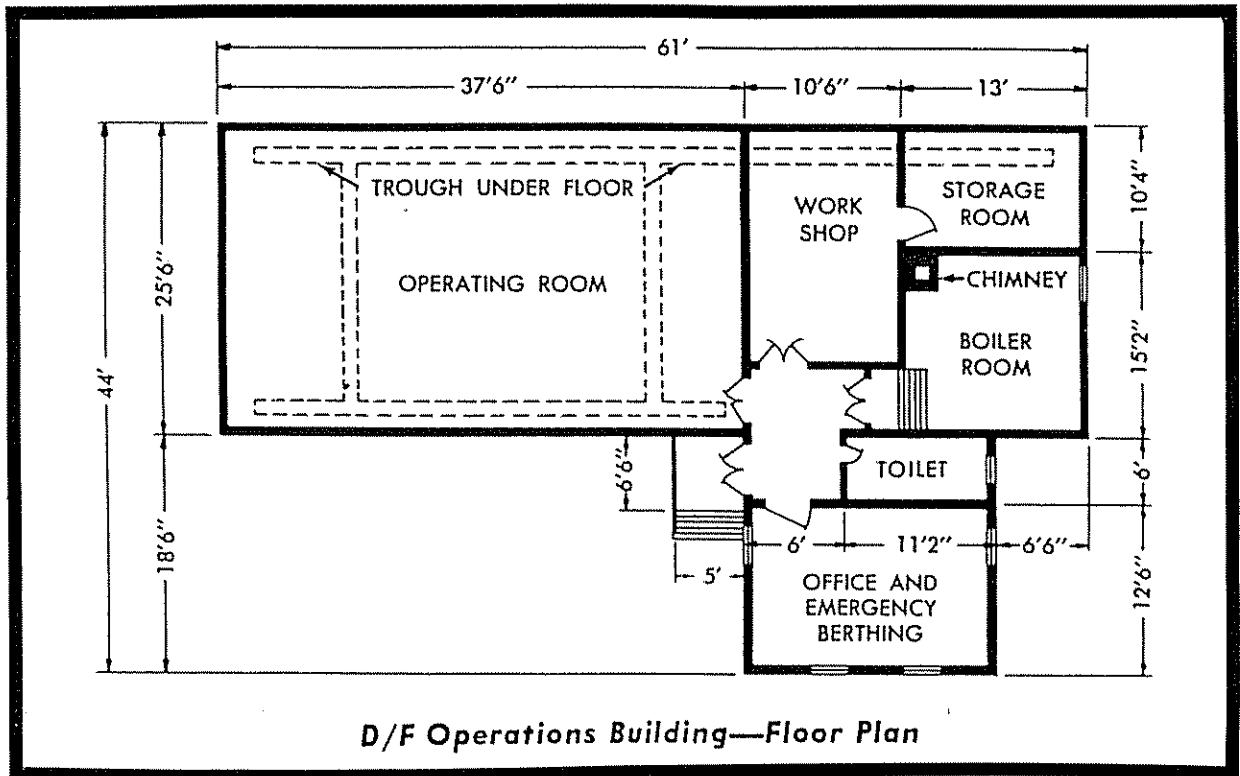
Typical 1950s D/F operations building showing floor plan layout (United States Navy, Bureau of Yards and Docks, *Radio Communications Facilities, Shore Based*, 26).
